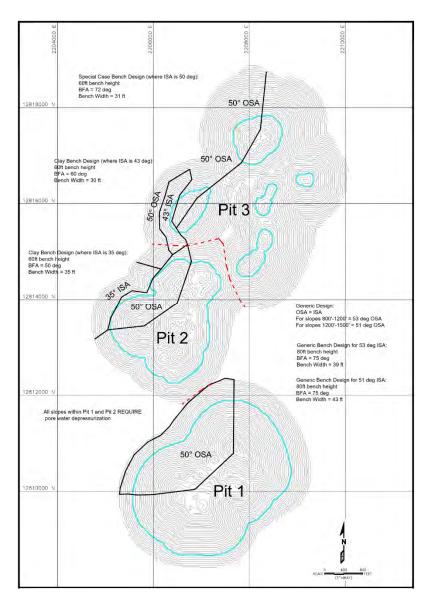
Slope Zones Defined by Call & Nicholas
